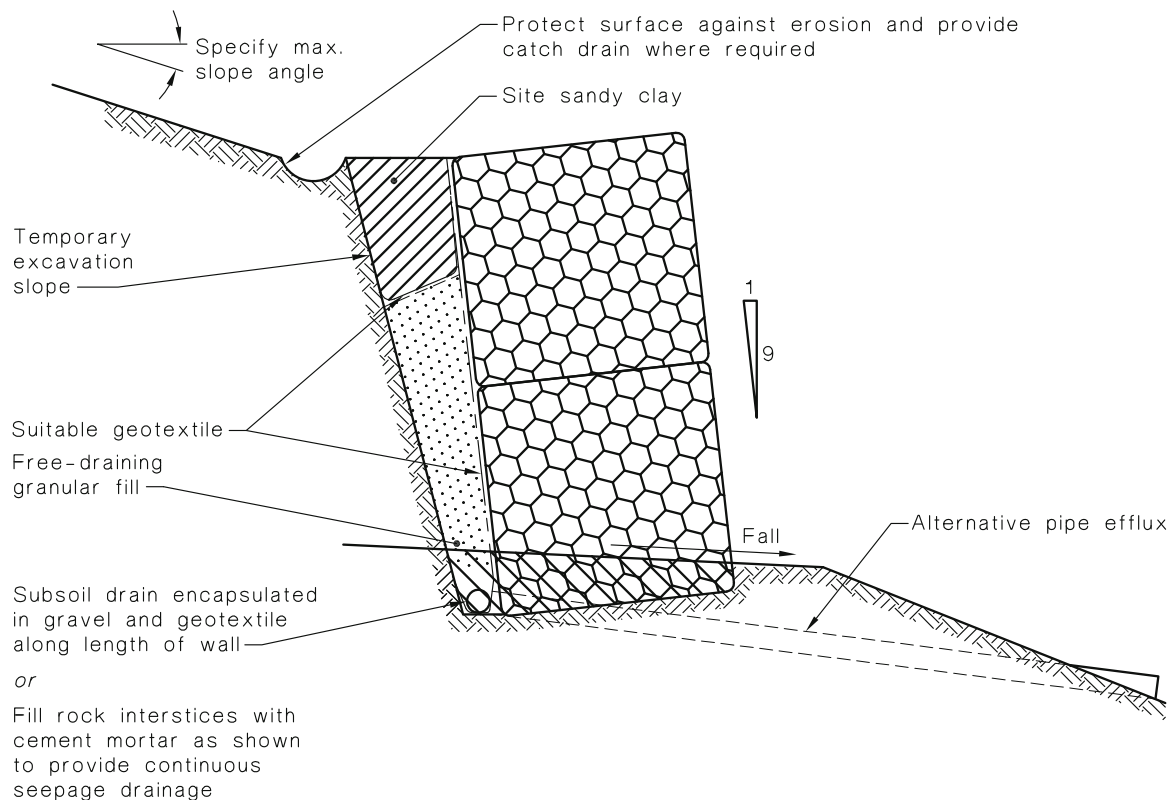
TYPICAL SECTION—GABION WALL DRAINAGE
